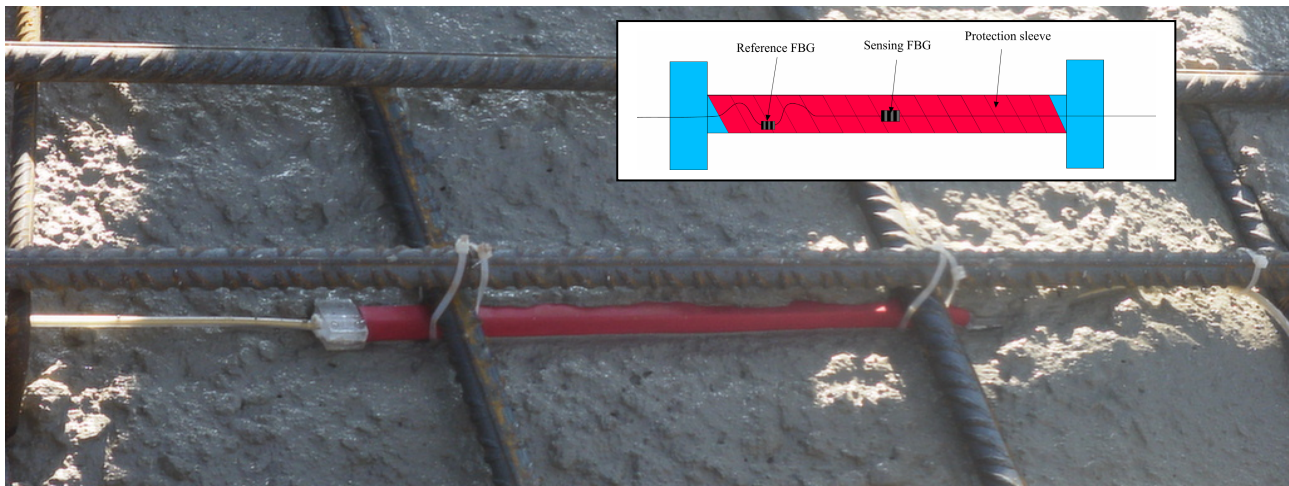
Temperature and Strain grating Transducer being embedded in Concrete. Courtesy of the Photonic Engineering Group of the University of Cantabria.
